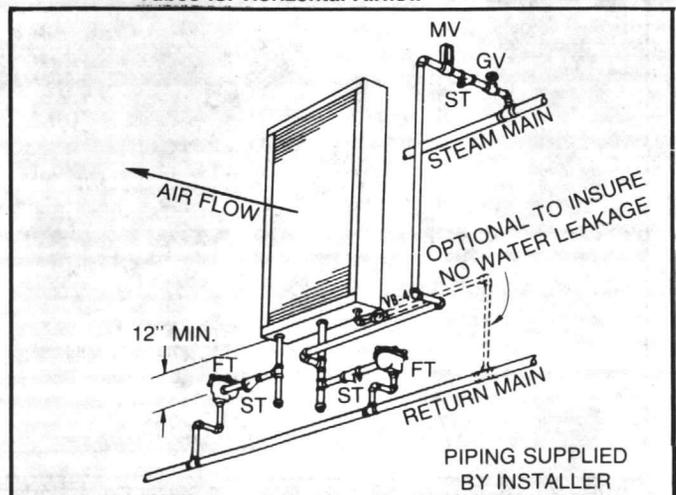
Typical Piping for Type NS Steam Coils and Vertical Tubes for Horizontal Airflow
